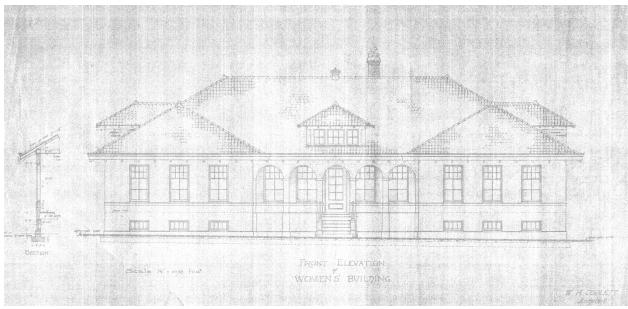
Building C, South Elevation William H. Corlett, 1912.
